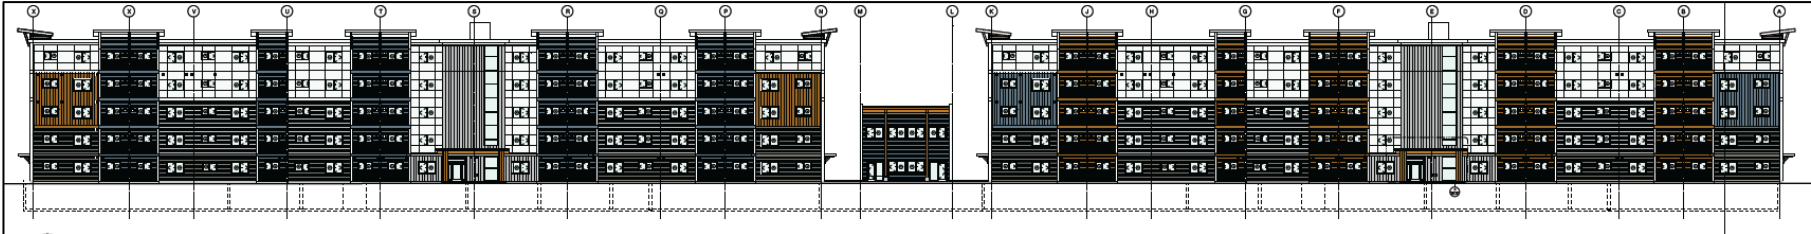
East Elevation of Proposed Buildings (Facing Parking Lot at Rear of Property)
